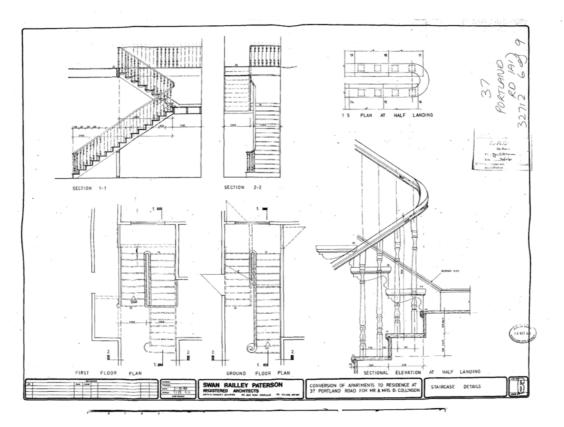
Detail drawings of the proposed reinstatement of the staircase (B/1980/4865 – Building Consent plan – O/32712/01, Auckland Council property file: 37 Portland Road, Remuera).
